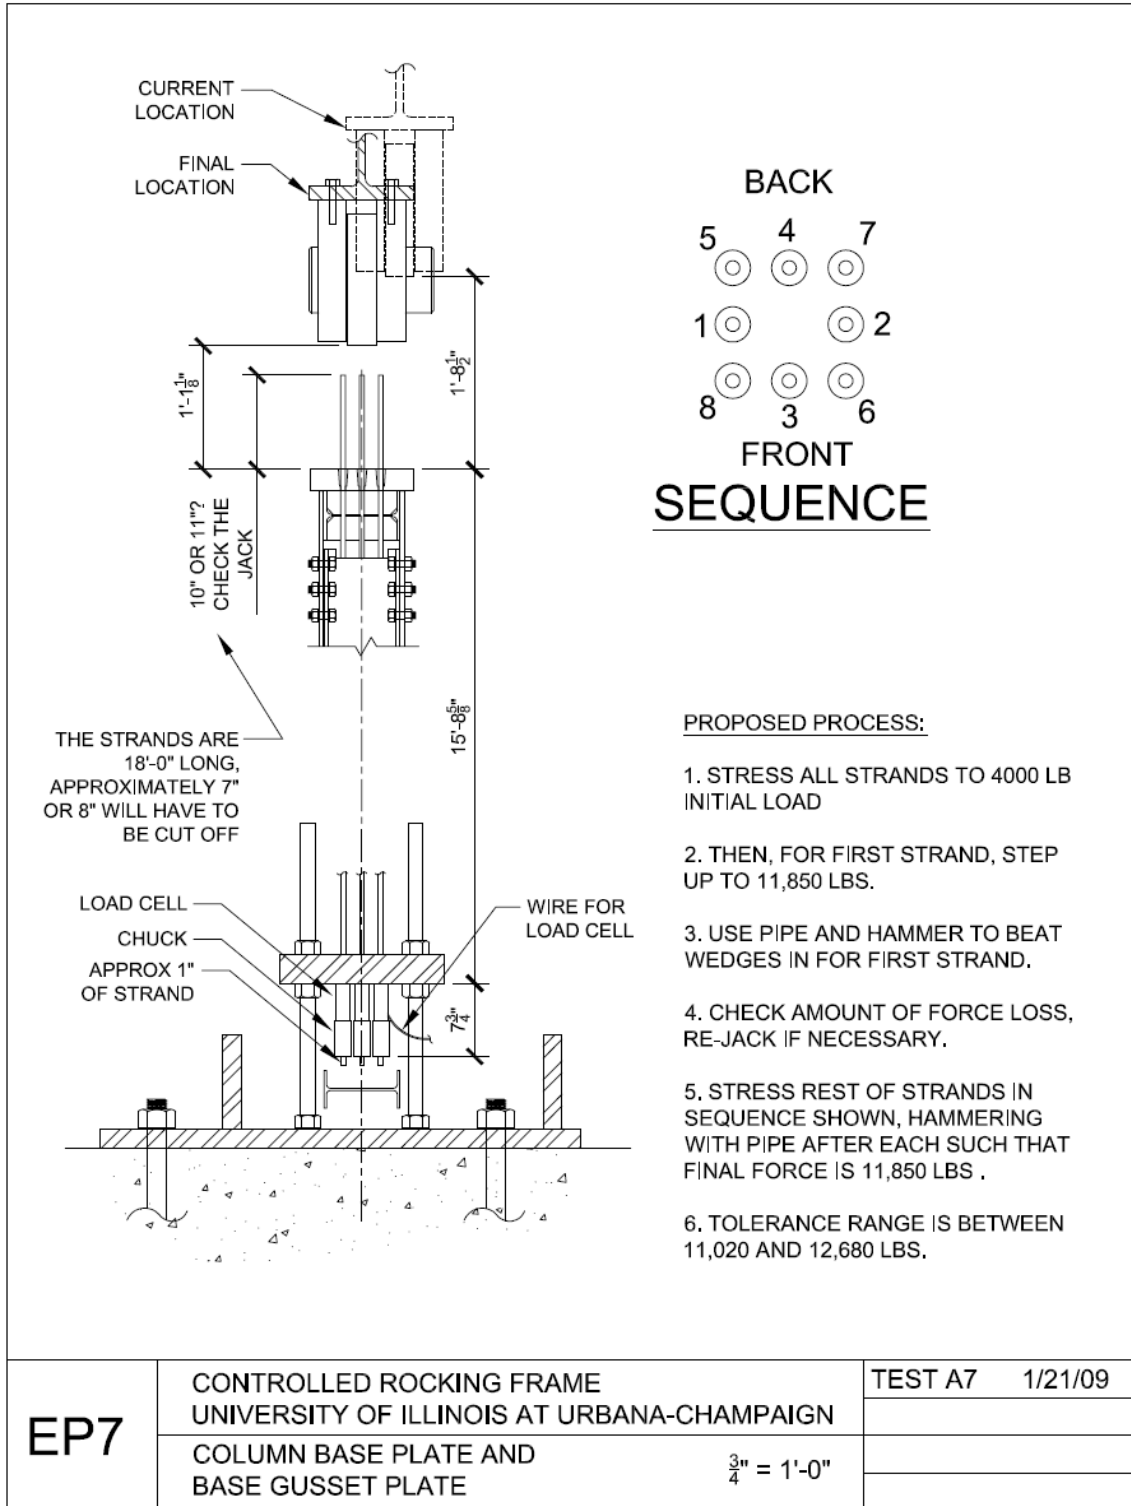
Erection Plan Drawing – Post-Tensioning Installation
